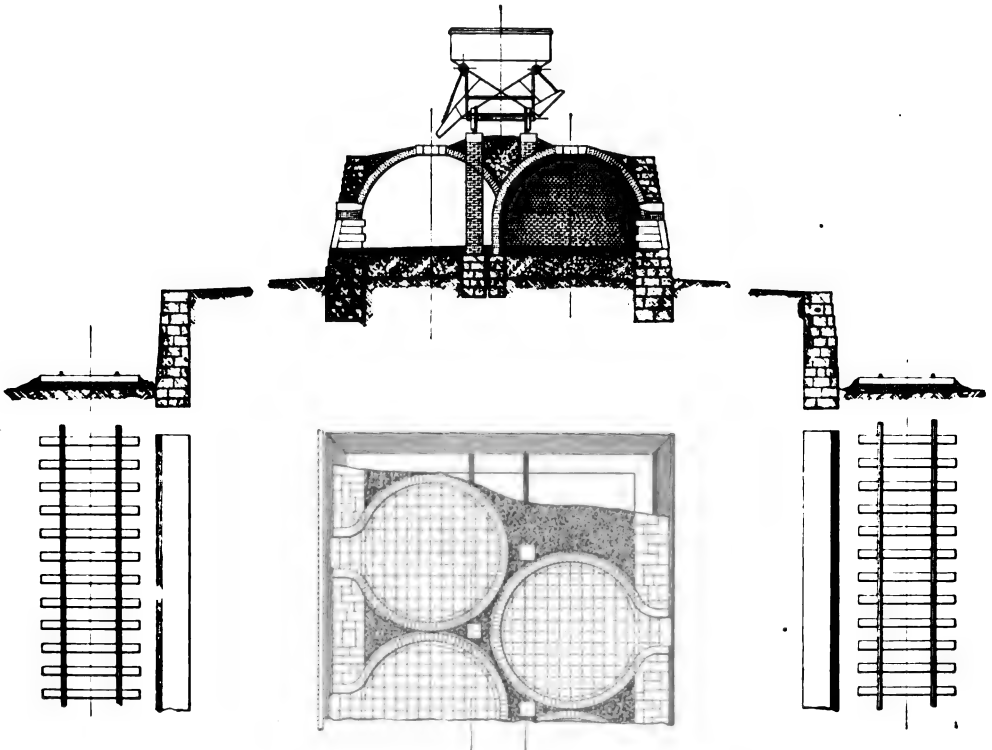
PLAN AND SECTION OF BEE-HIVE OVENS.
